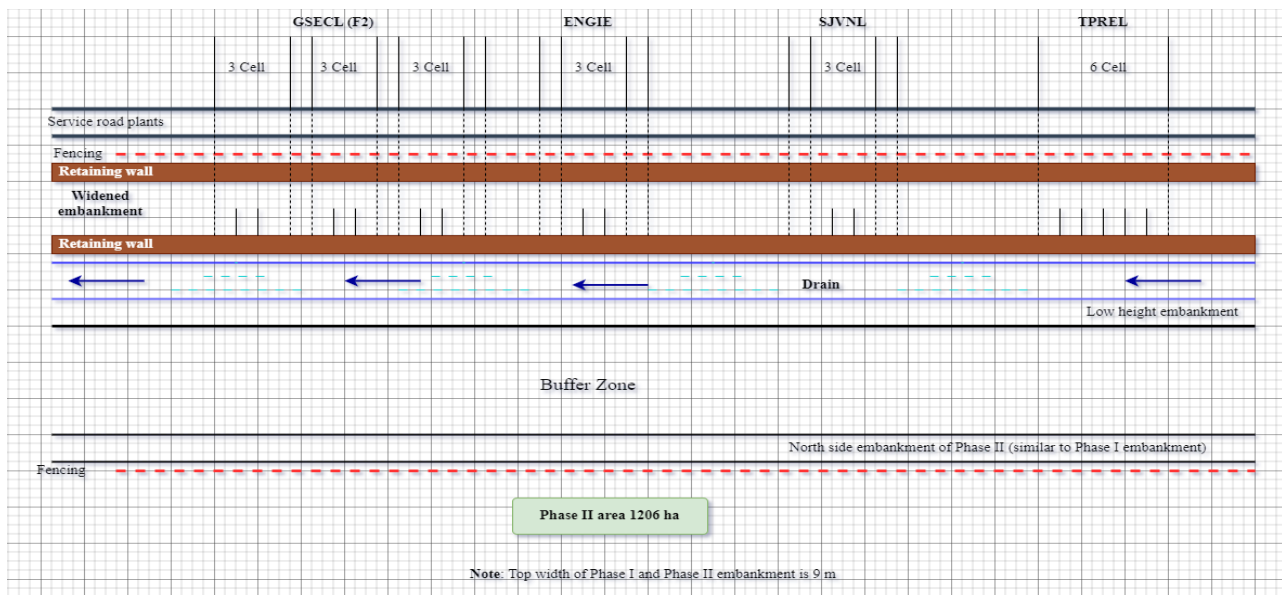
Plan view of phase I box culverts, embankment, retaining walls, drain, buffer zone
